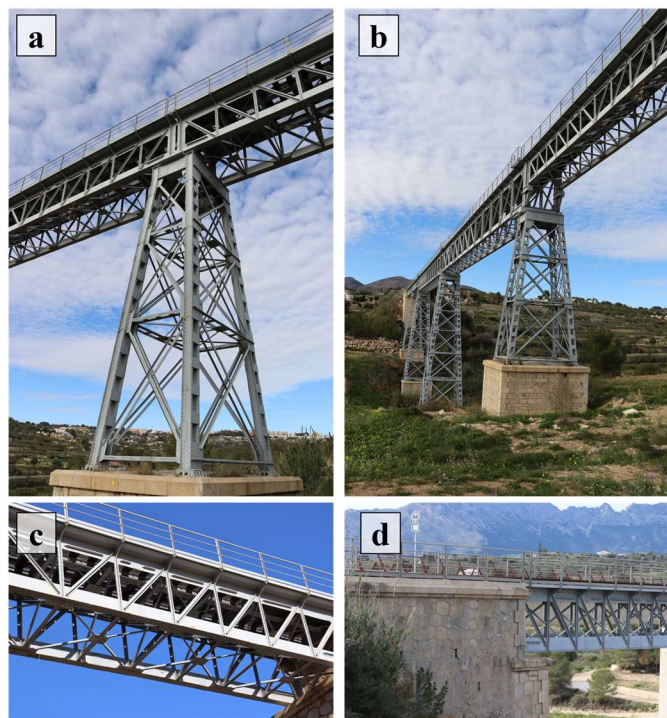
General View of bridge. a) bridge pier. b) entire view of the bridge. c) isostatic span. d) masonry abutments.
